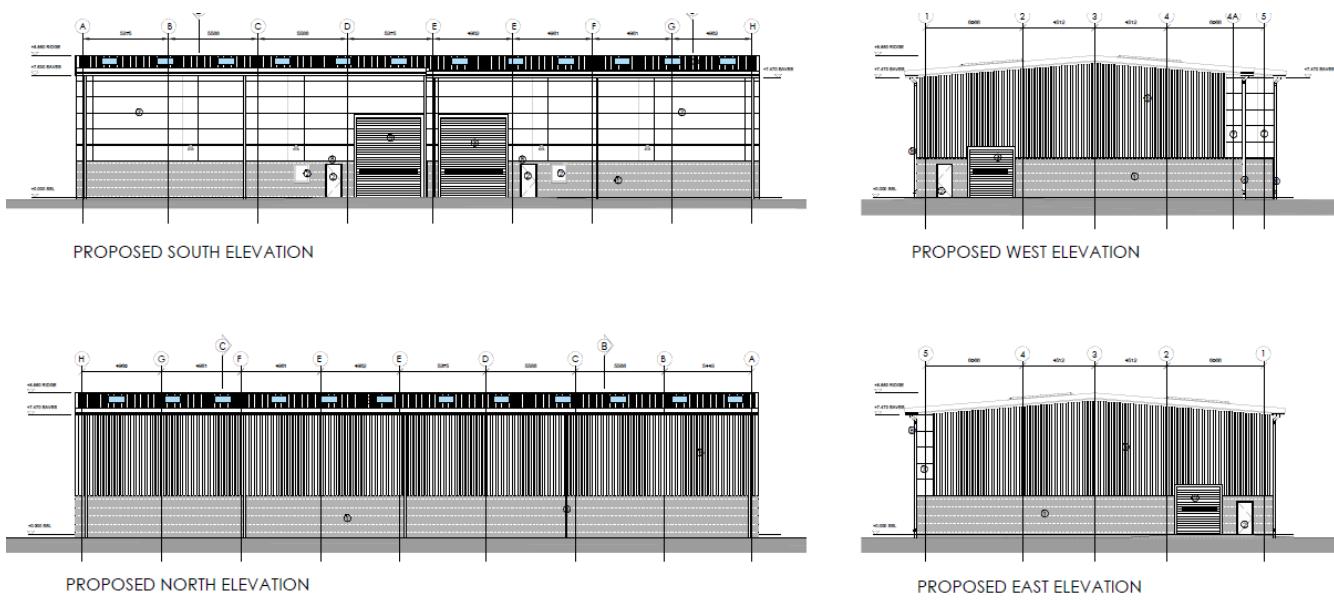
Proposed Elevations of Units 6 & 7 (Courtesy of afa architects and planners)
